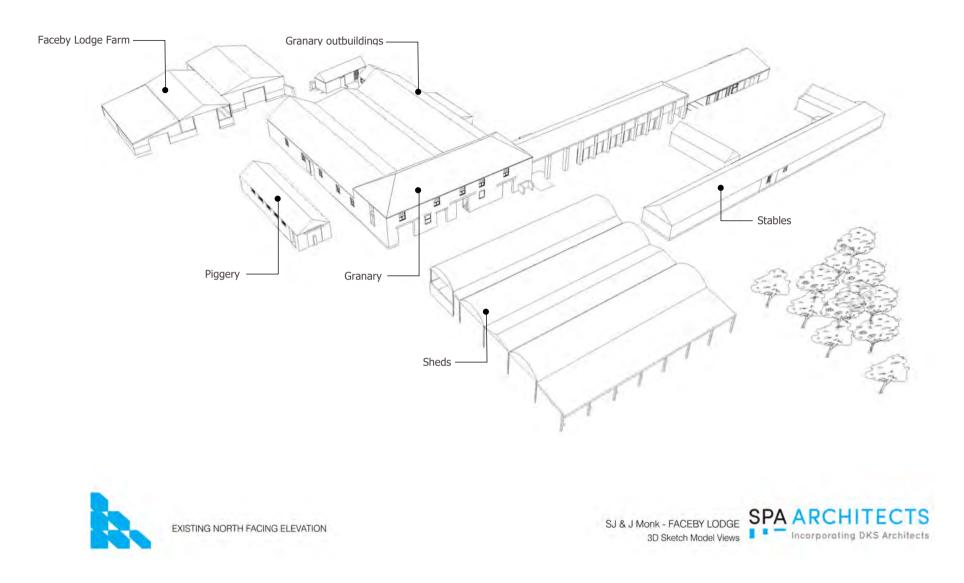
Perspective drawing of Existing Buildings as viewed from the north
